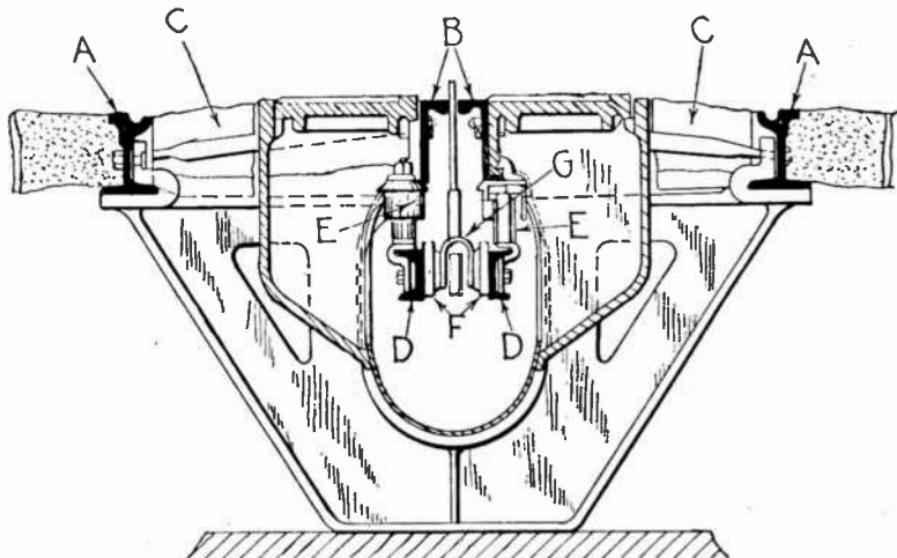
,203.—Yoke construction for conduit or underground trolley, as installed on Metropolitan Railways, New York City. These yokes were placed 5 feet apart in an excavation made through the street. The track rails A, A, and the slot rails, B, B, were then laid on the yokes, and the ties C, C, inserted. The whole structure was then blocked up, surfaced and lined, and constituted the track construction. The conductors consist of two channel beams, D, D, placed 6 inches apart and supported by insulators E, E, at each yoke. The contact rail joints are bonded in a manner somewhat similar to ordinary rail bonding, and form a complete metallic circuit having a pressure of 500 volts between the conductors. The current from these conductors passes through the slot or opening between the slot rails and extends into the conduit to a distance sufficient to bring the plow contacts or shoes F, against the conductors. The spring G, tends to keep the shoes normally about 8 inches apart, so that when they are pressed into the 6 inch space between the conductors, they maintain a firm sliding contact with the latter. Hand holes provided with iron covers are placed about 15 feet apart directly over the insulators. The manholes are placed about 150 feet apart, and usually between the tracks. Arrangements are made at these points to drain the conduit into the sewers. The bottom of the conduit is given a minimum grade of 2 inches to 100 feet, so as to insure proper drainage on sections of level track. The contact rails are treated like a double trolley wire, and the feeders and mains are laid in underground conduits. This system is so expensive to install that its use is limited to only the largest cities where for various reasons the use of the overhead trolley is objectionable and prohibited.
